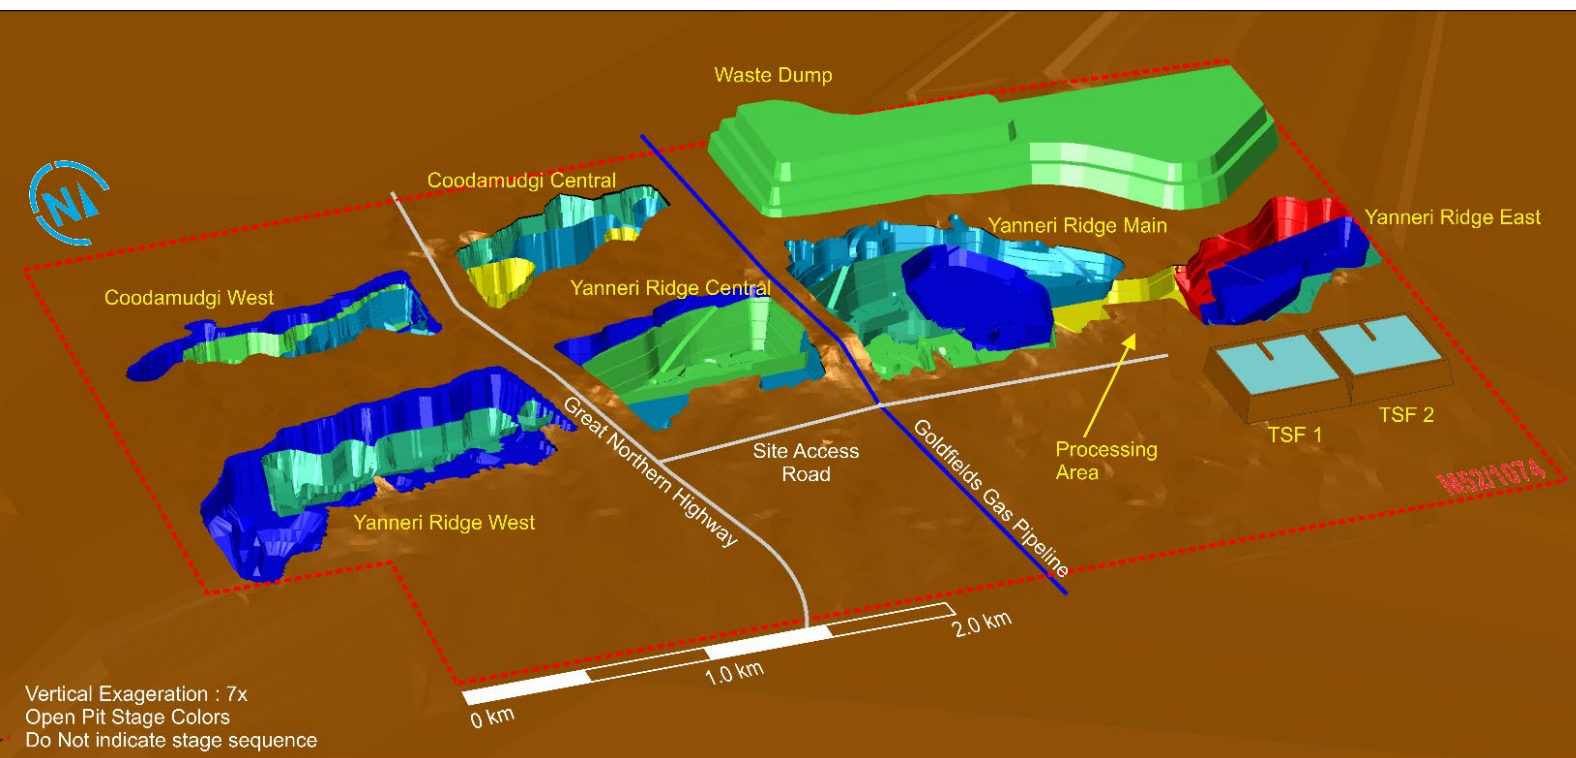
Butcherbird site layout showing open pit staging - Looking Northeast
